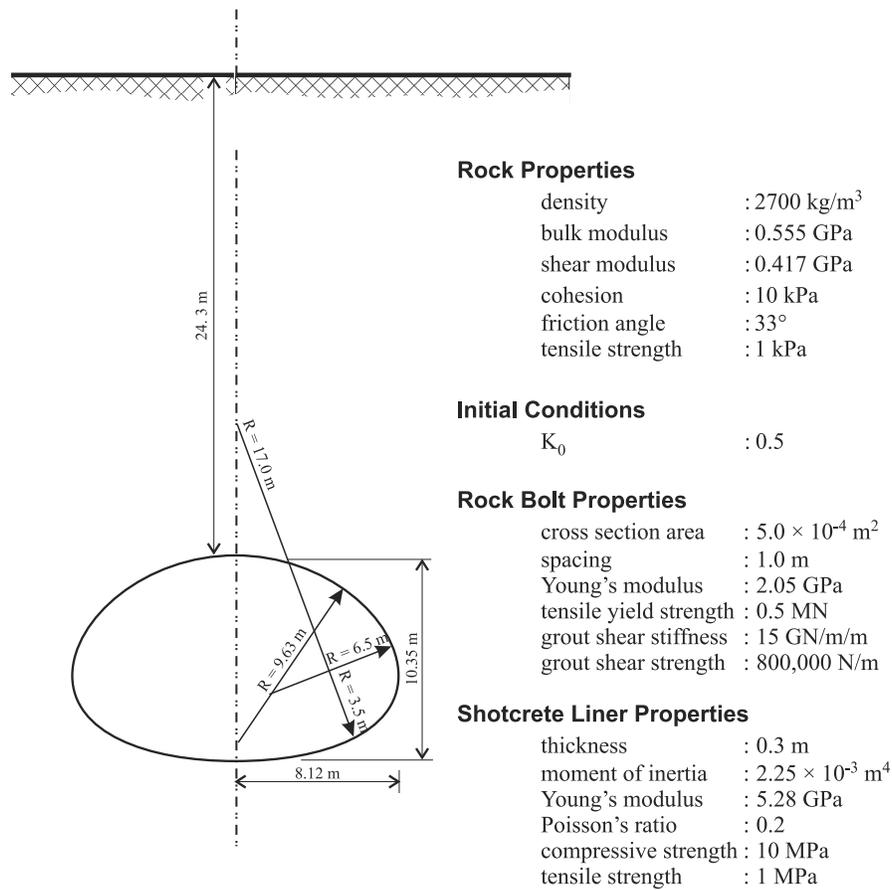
Construction conditions for a multistage tunnel excavation and support
